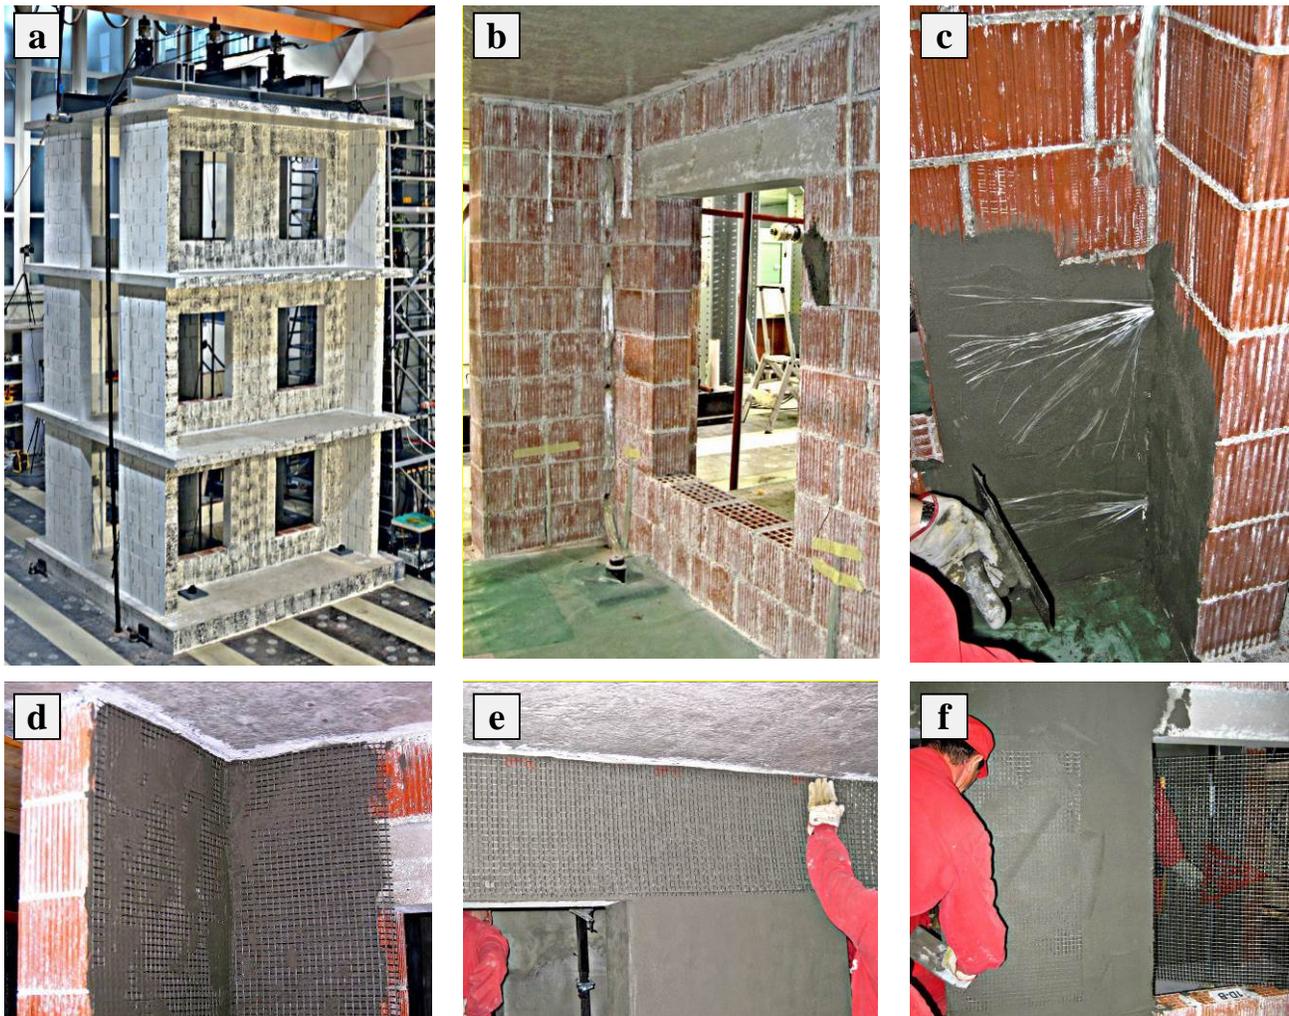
a: test specimen before strengthening; b: placing of glass fibre anchors; c: spreading the fibres; d: application of vertical strips on cross and shear walls; e: placing the horizontal grid; f: wraparound of the middle pier.
